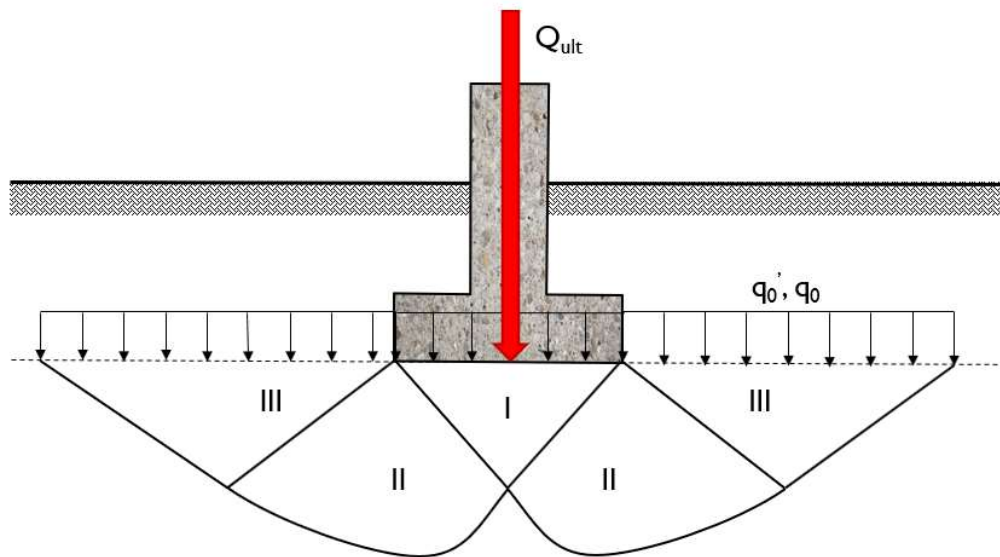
Terzaghi's general bearing failure surfaces
